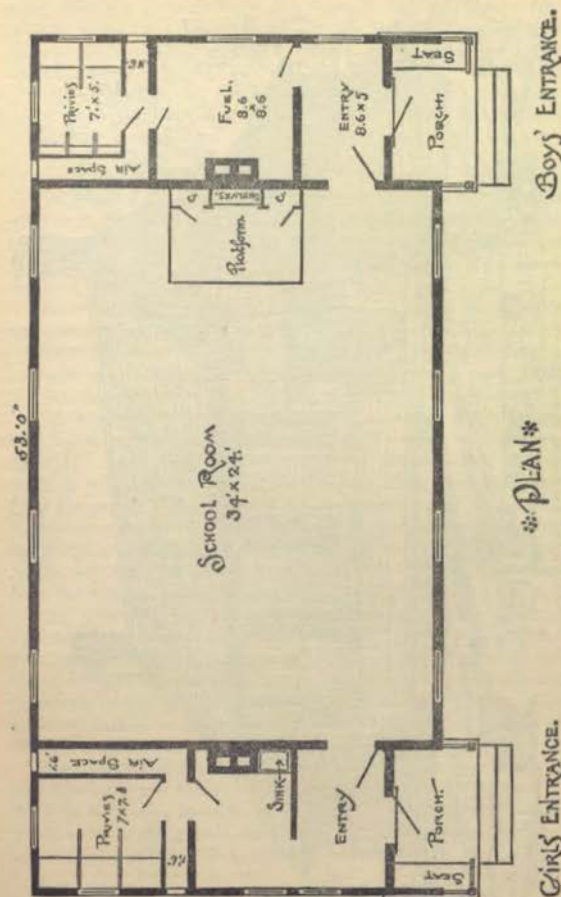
GROUND PLAN OF MODEL SCHOOL HOUSE.
